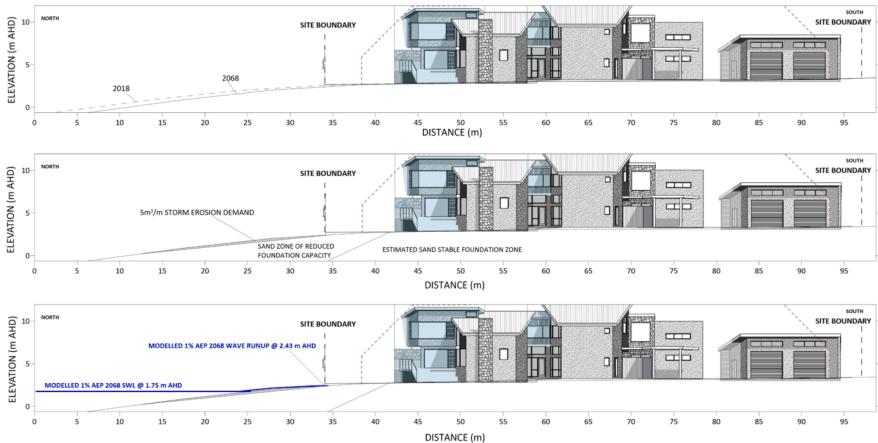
Site Cross Sections Demonstrating 2070 Recession, 5 m3/m Storm Erosion Demand, and Inferred Inundation Levels & Wave Runup Extent
